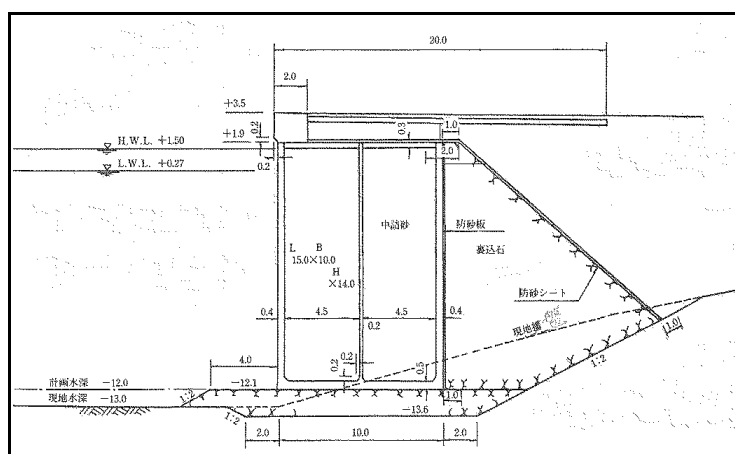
Example of Gravity Type Quay Wall Design (Caisson Type)
